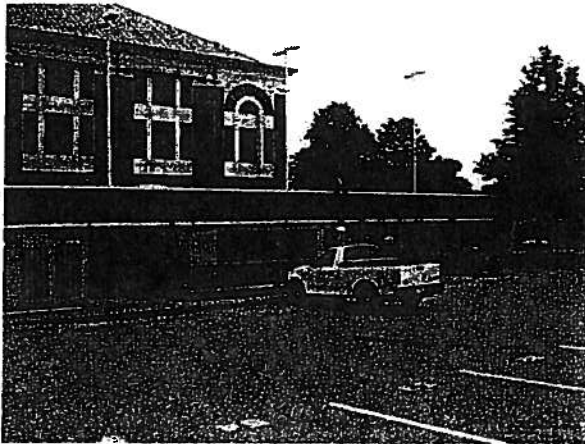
Elevated parking and city hall roof with roof drains to test area.
